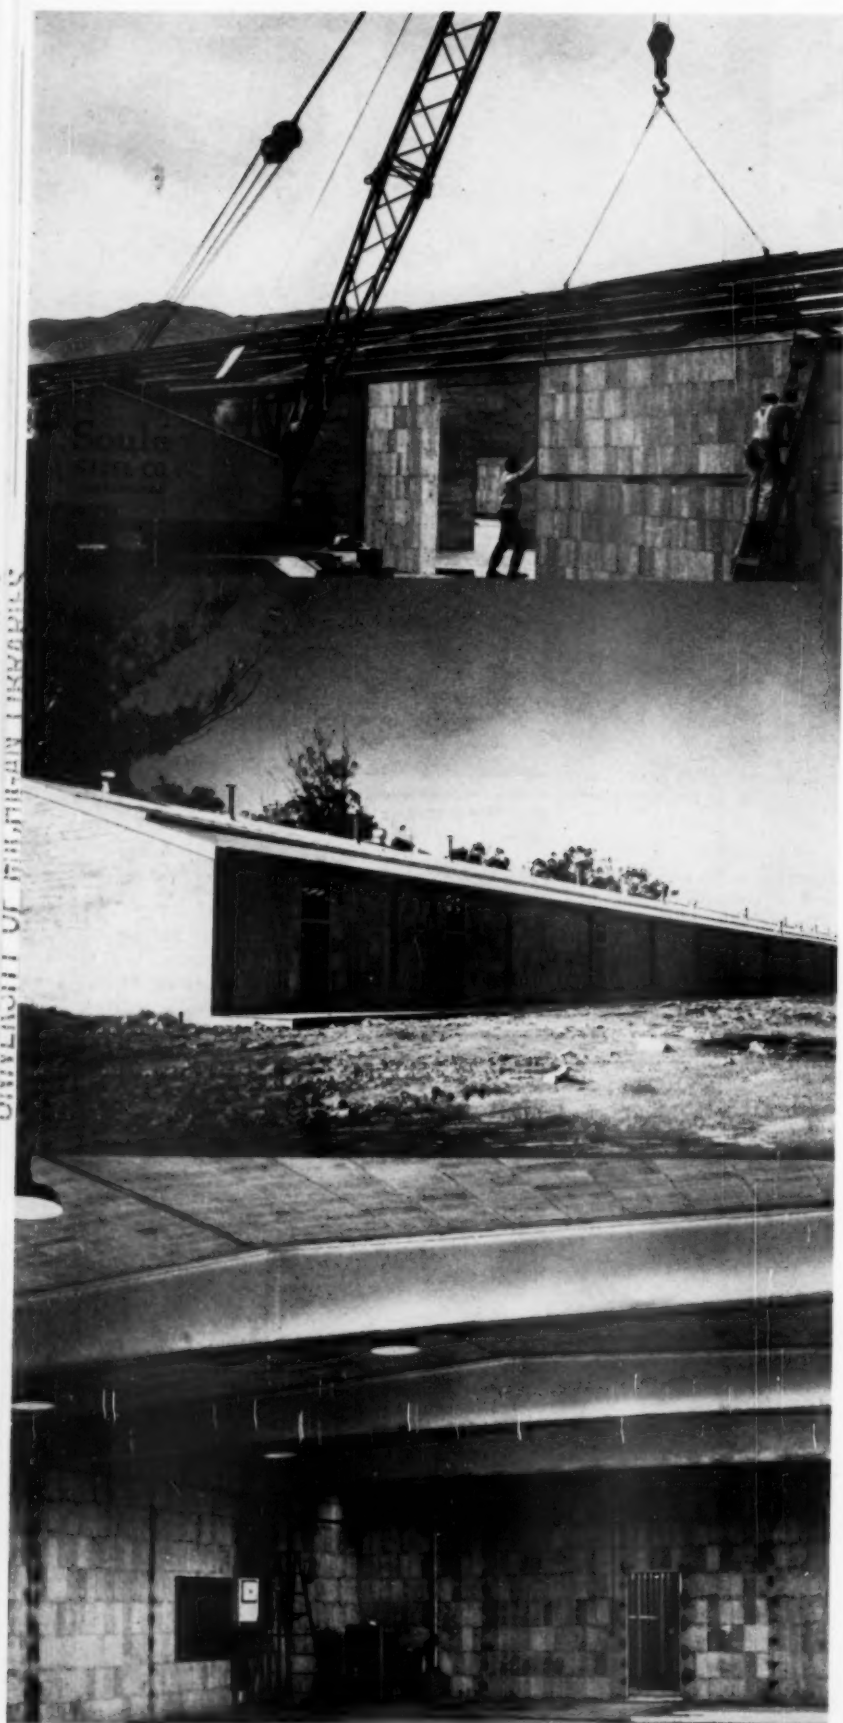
Positioning panels of Strestcrete tongue and groove siding on a steel frame building
